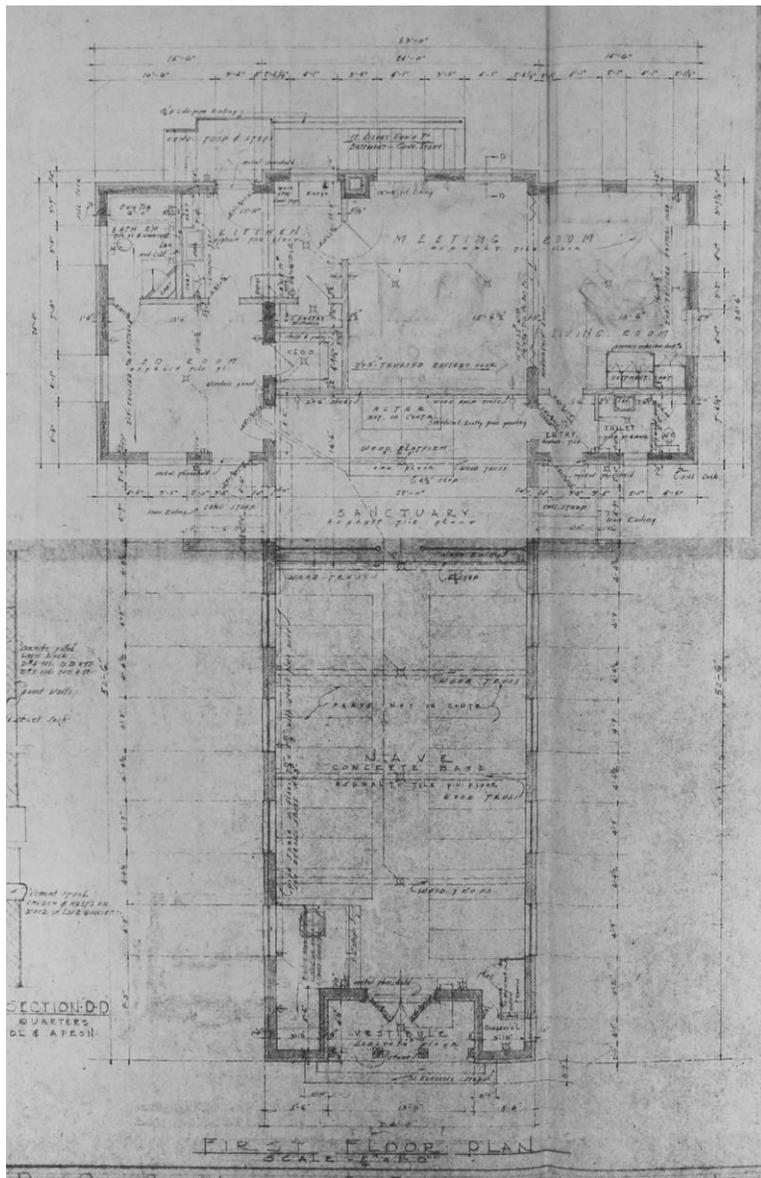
1955 Floor Plan of Saint Catherine of Siena Catholic Church. Scan of original plans located within the building.
